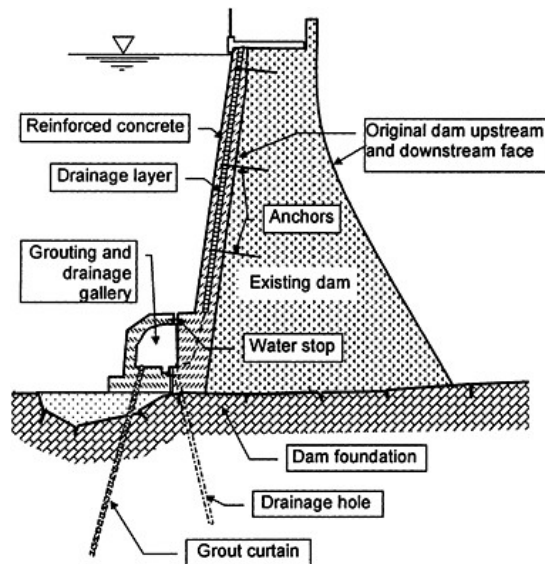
Typical reinforced concrete sealing-plinth system for rehabilitation of (masonry) gravity dams.
